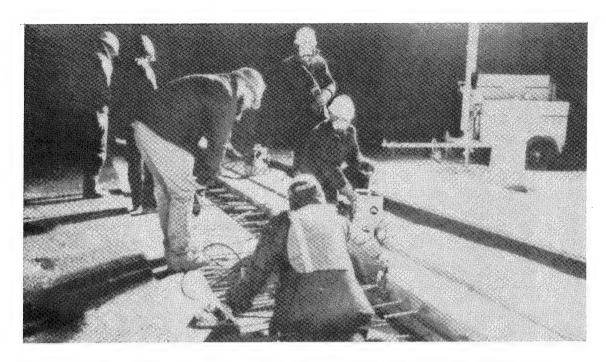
Space between anchor panels allows for posttensioning, Woodrow Wilson Memorial Bridge (from ASCE 1984)
